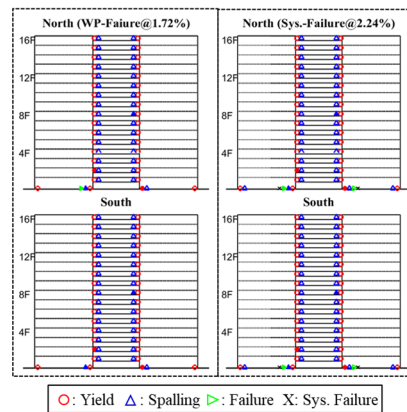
shows the damage progression of CCW60 with the roof drift. Most coupling beams yielded at a drift of 0.26%, followed by the wall pier yielded at 0.37%. Coupling beams initially occurred the cover spalling at a drift of 0.71%. The maximum base shear is 7215 kN with a drift of 0.75%. After the cover spalling of most coupling beams at a drift of 1.16%, the wall pier base appeared the cover spalling.
